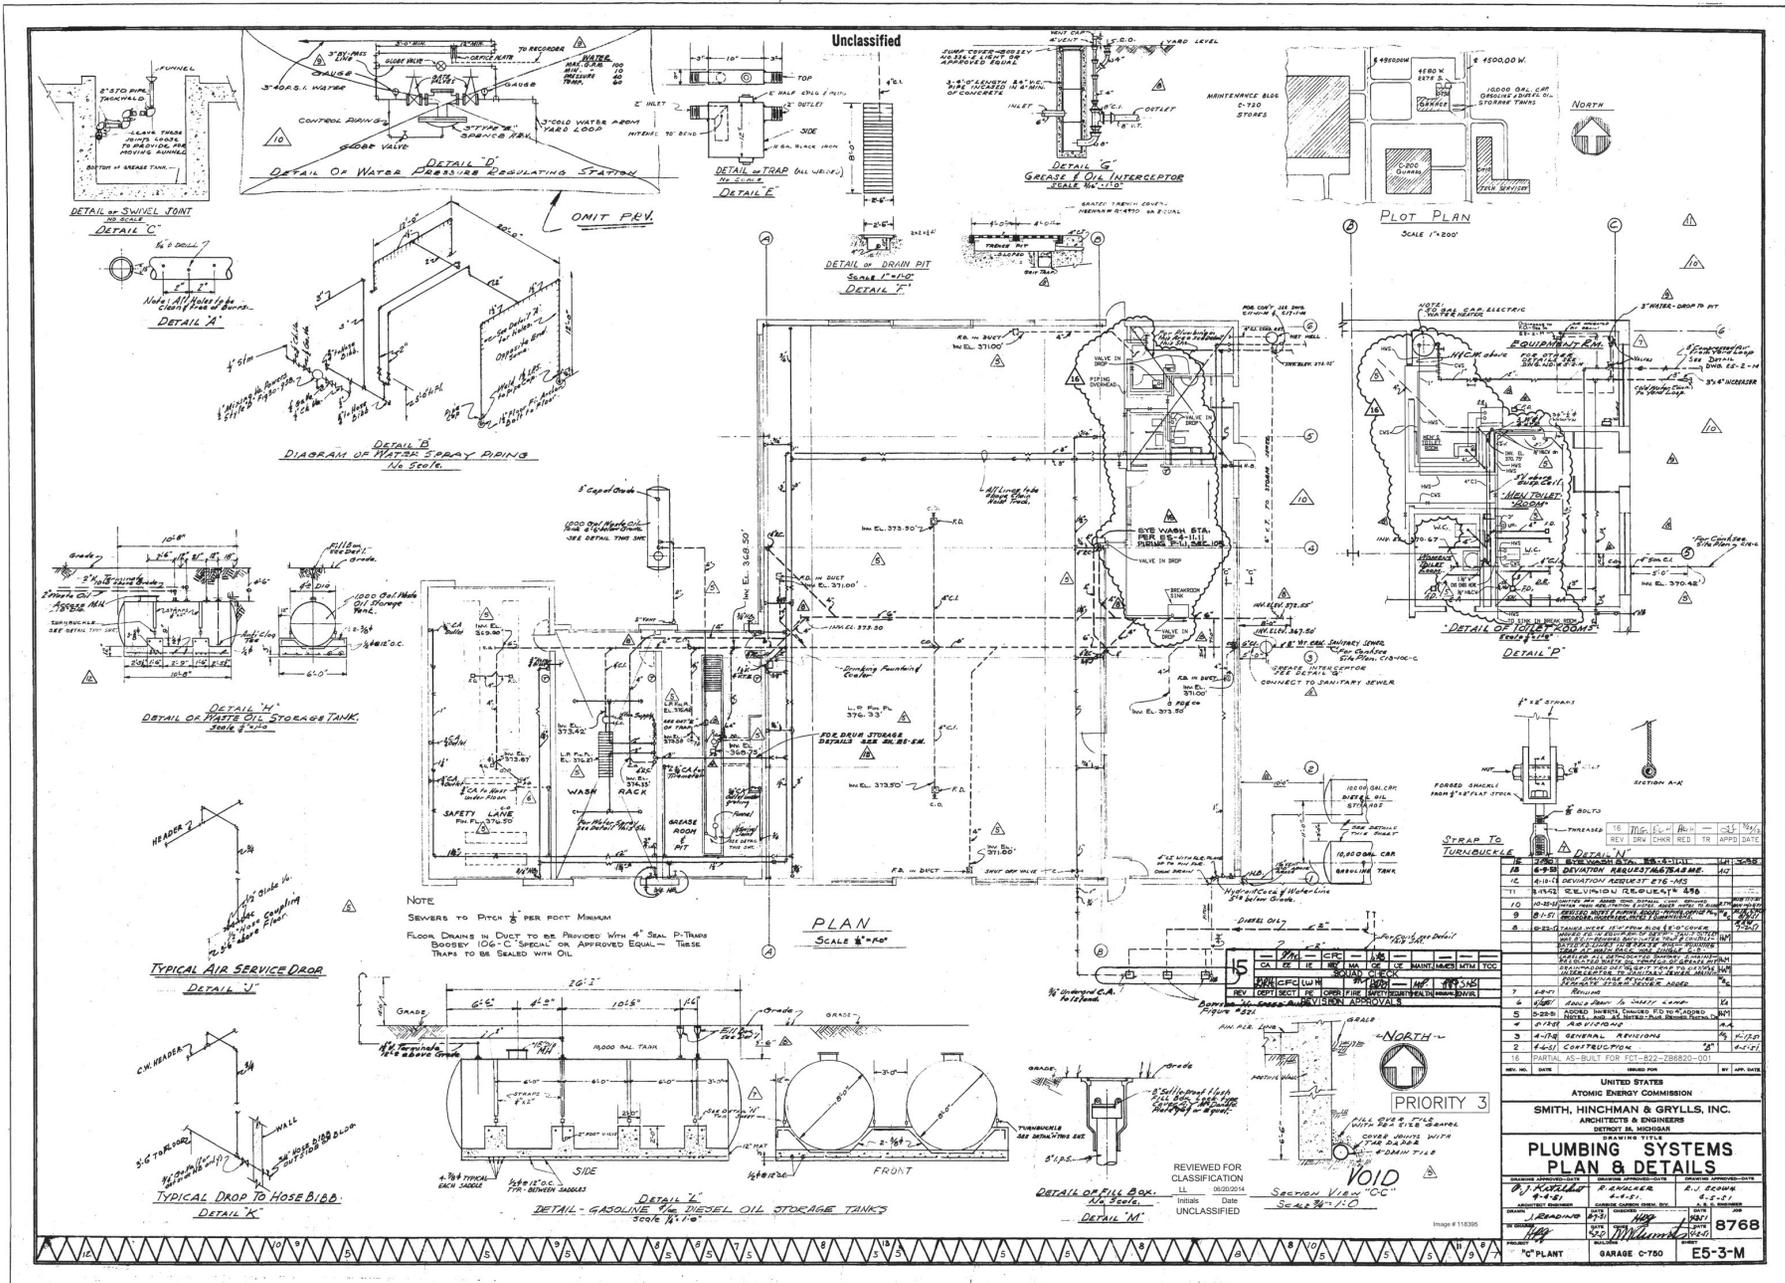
Engineering Drawing E5-3-M_0001_0016_U-105988
